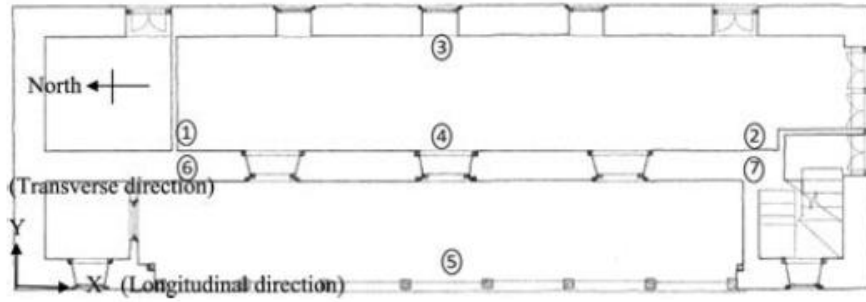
Building Plan and Microtremor Measurement Locations (Parajuli et al., 2011)
